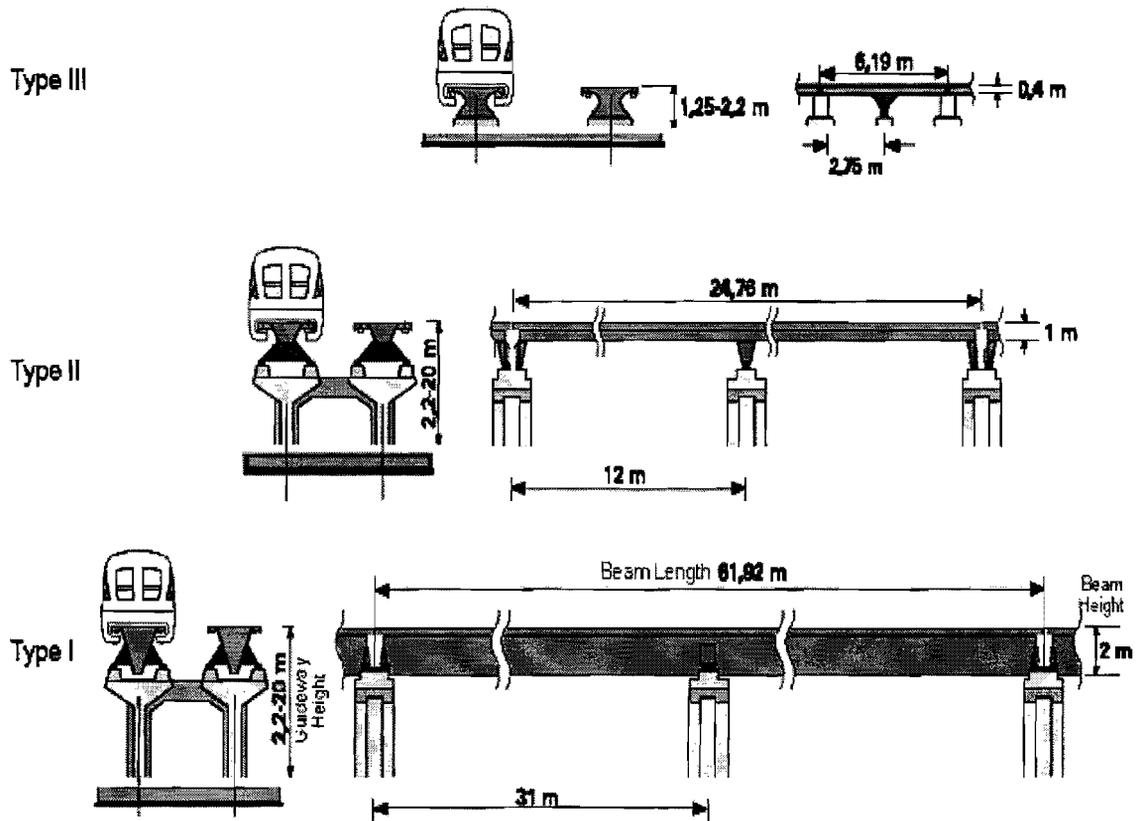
Elevated and at-grade guideway design [Transrapid]
